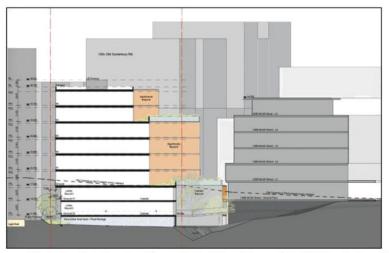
Indicative Section Through Building Massed to Old Canterbury Rd
